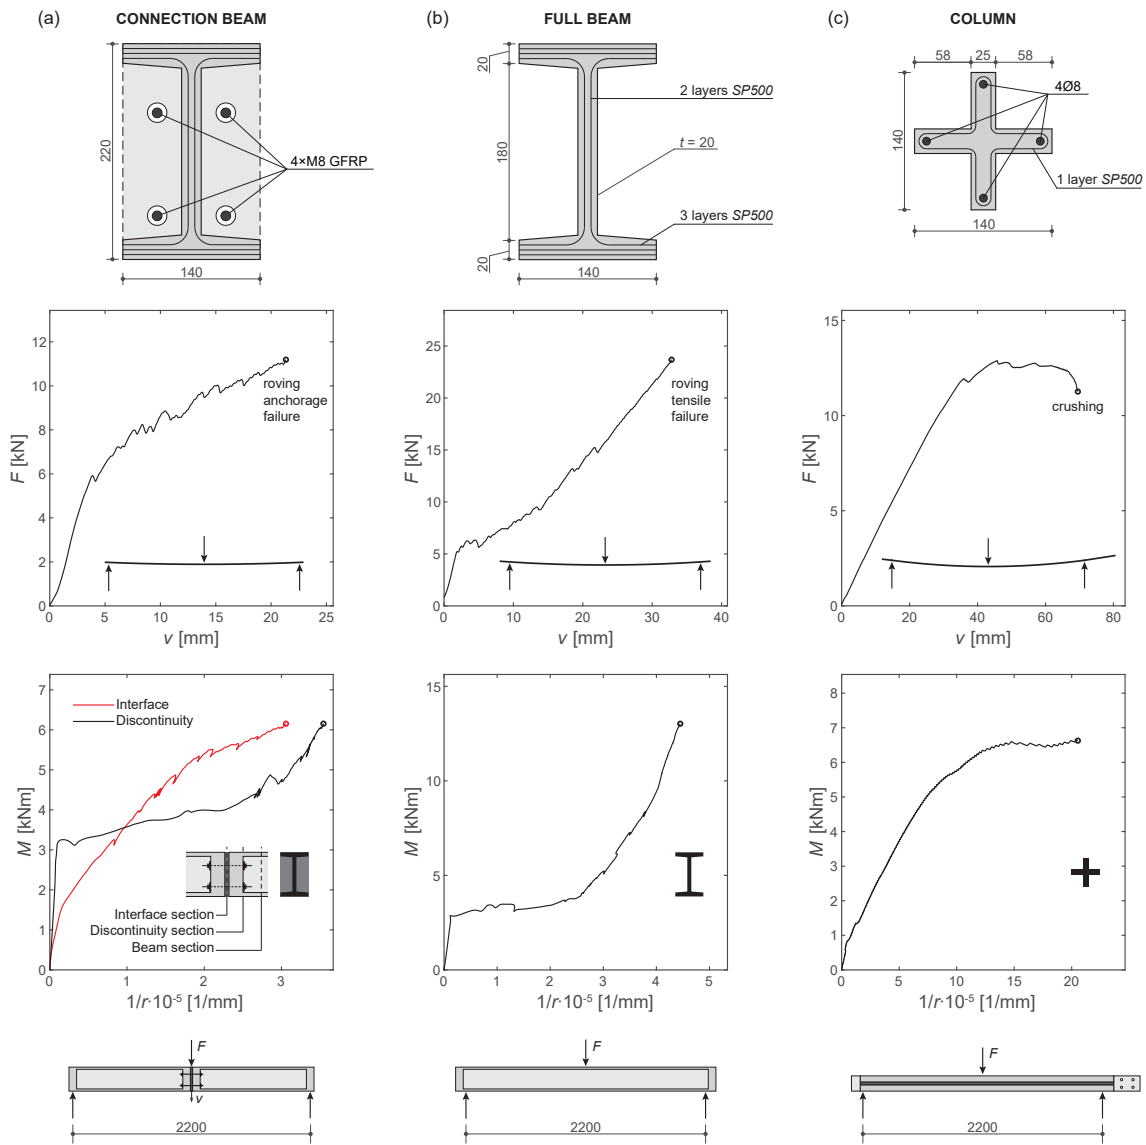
Flexural tests of the pavilion elements: (a) connection; (b) foundation beam, and (c) column.
